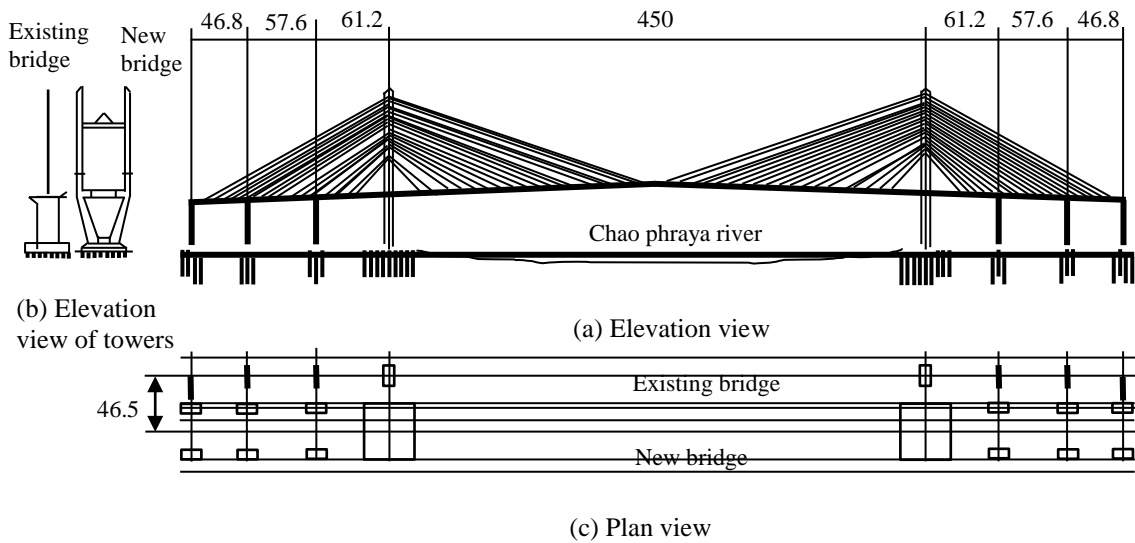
Layout of the existing and the new Rama IX bridge (unit: m.).
